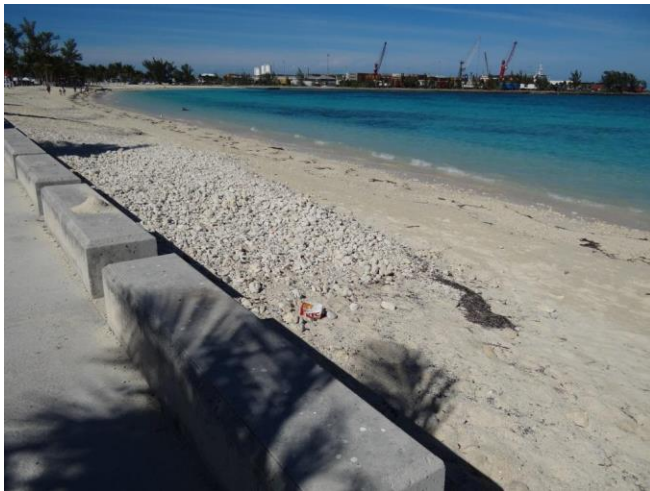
Accumulation of Rocky Rubble and Recent Sea Wall Repairs along Western Esplanade - Facing West
